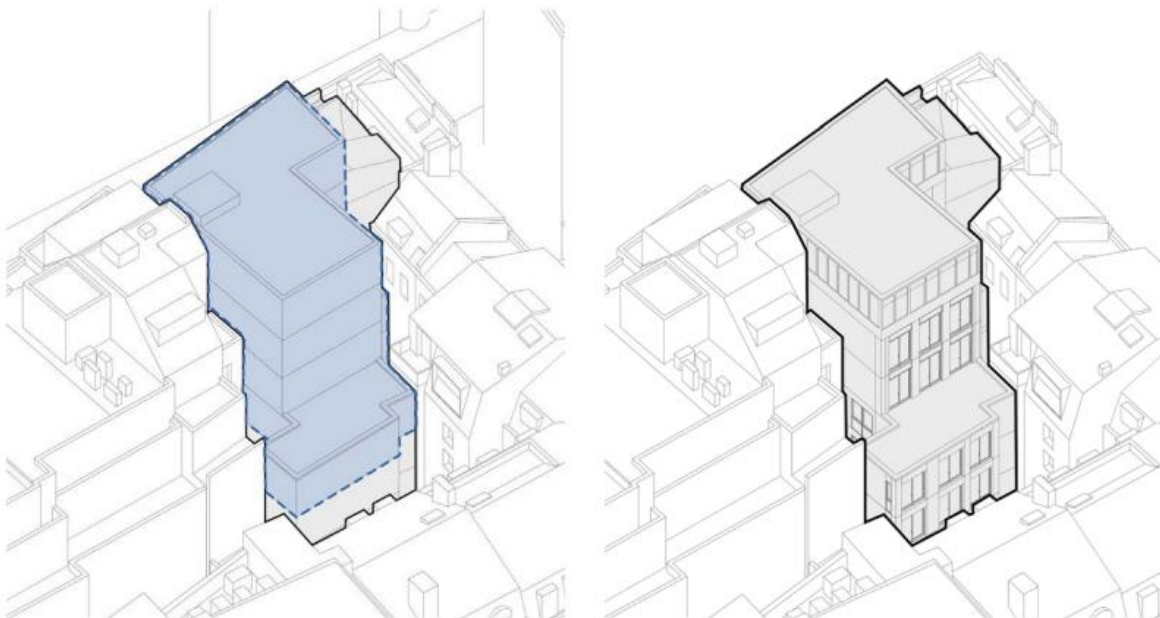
Current proposal (latest cutback of 3rd,4th and 5th floor not shown*)
